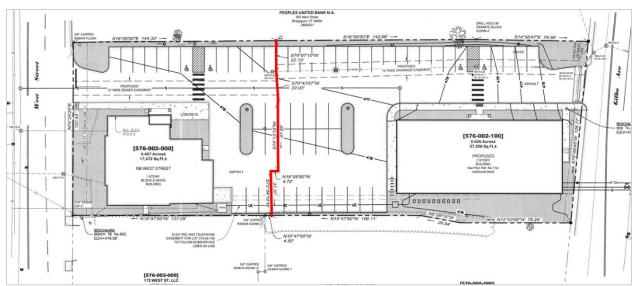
An excerpt from the 2-lot subdivision plan that was approved by the Planning Board for 166 West Street in March 2021 (S-01-21), with the proposed new property line shown in red.
